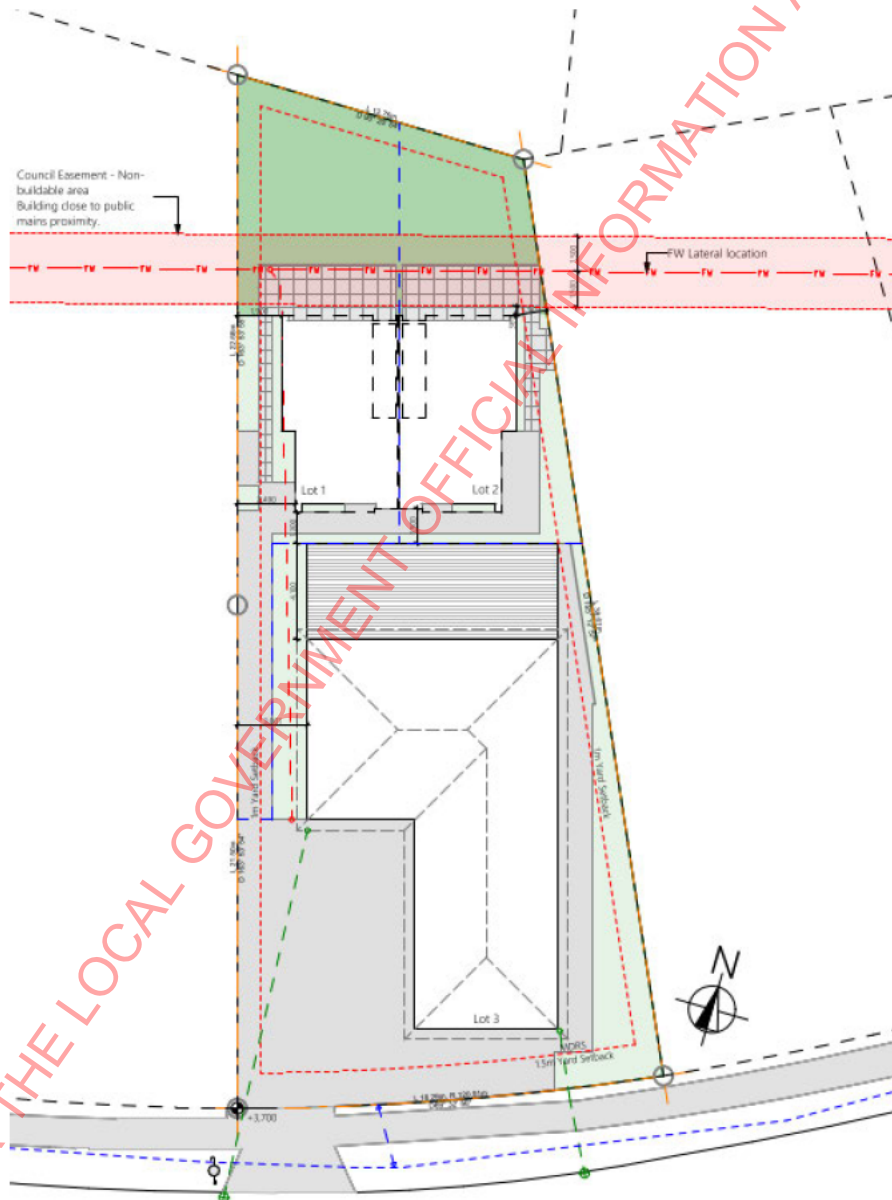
Proposed Development. Source: Prime Designs Plans – Appendix B
